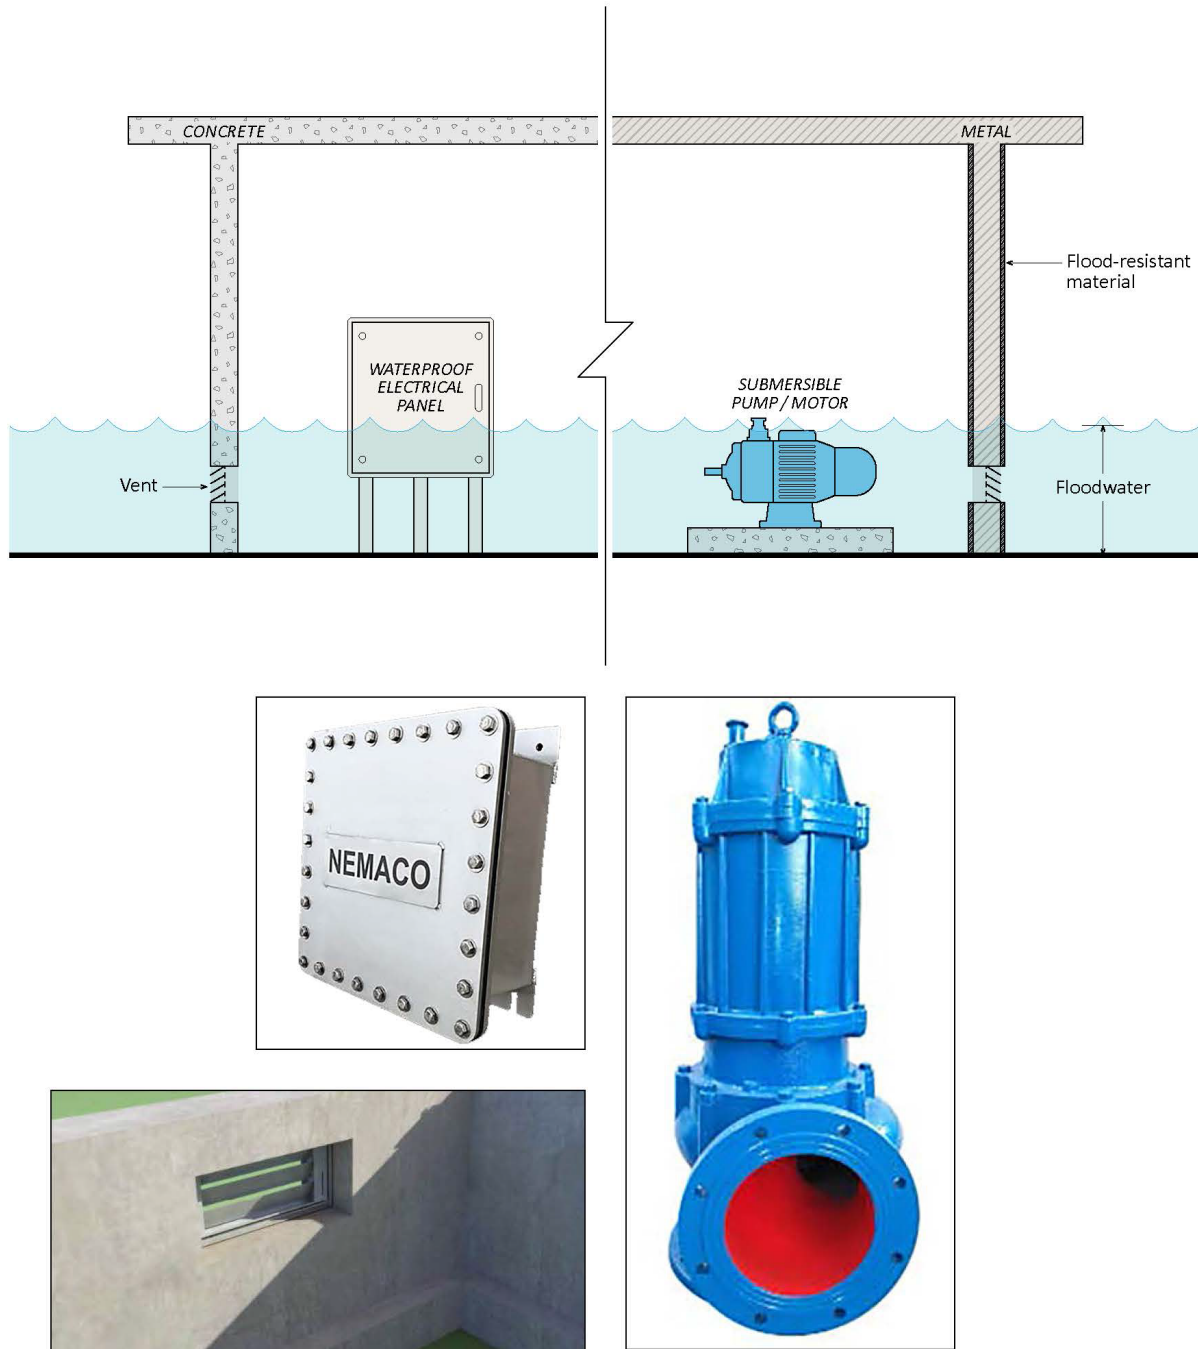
Wet Floodproofing – Use of Submersible Equipment and Cabinetry
